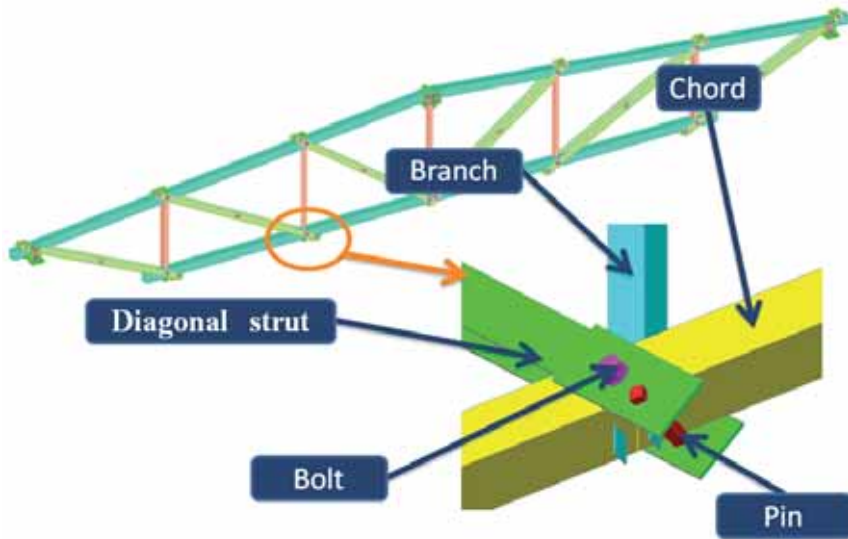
View one selected joint (with pin) type N from non-welded truss.
